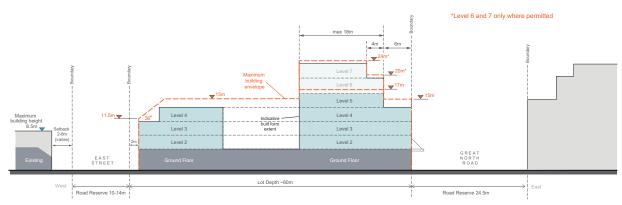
Example Street Frontage Section showing maximum potential building height
